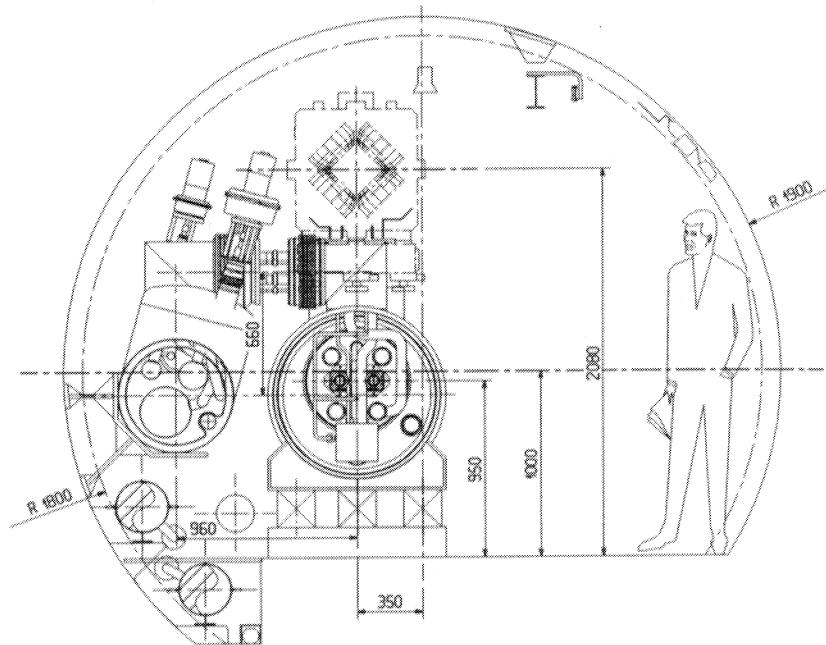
Transverse cross-section of the LHC tunnel at a short straight section
